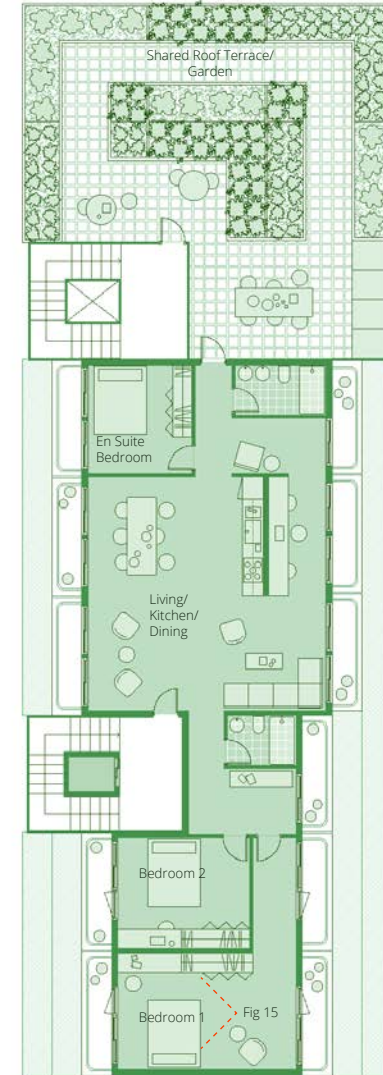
Fifth Floor Plan: Multigenerational Family Unit
